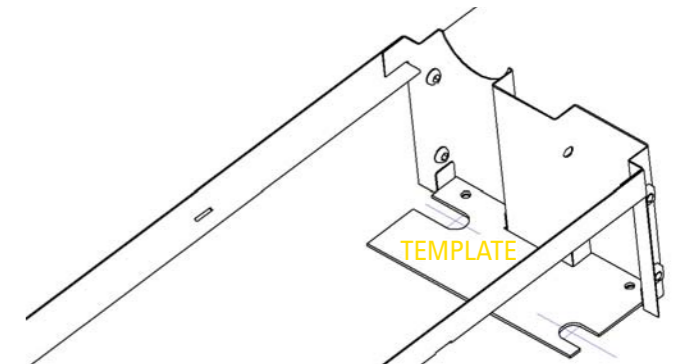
Remove the convector body. Adjust the convector bearing frame to the required position. Place the template on the floor at the place of heating water supply / removal as shown in the picture. Mark holes for convector fixing in the floor.
